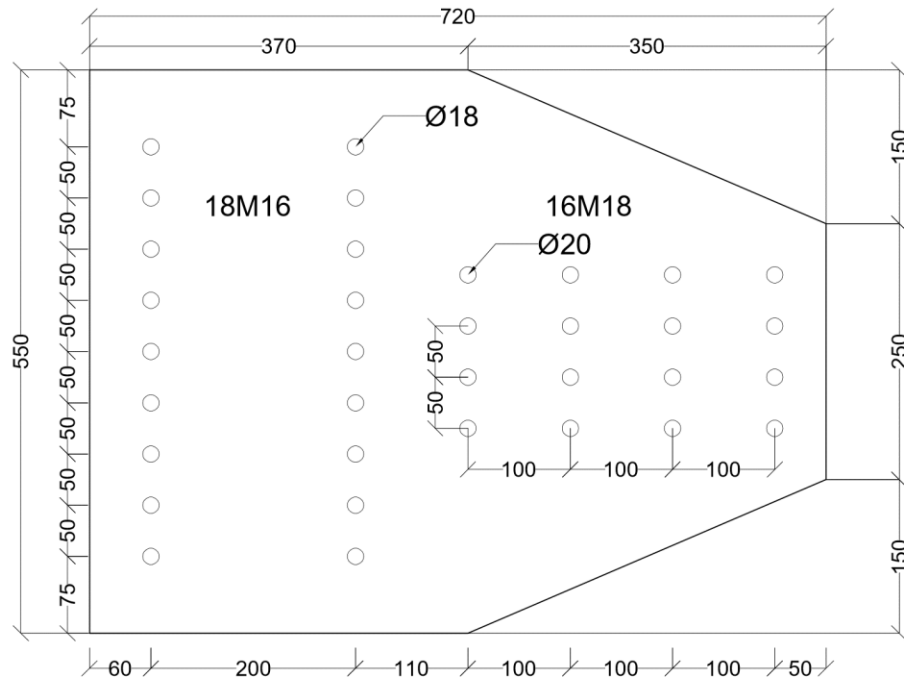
Gusset plate dimensions with bolt group arrangements - Dimensions in [mm]
